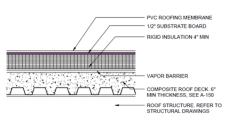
PVC Roof (From Construction Documents Provided by MBP)
